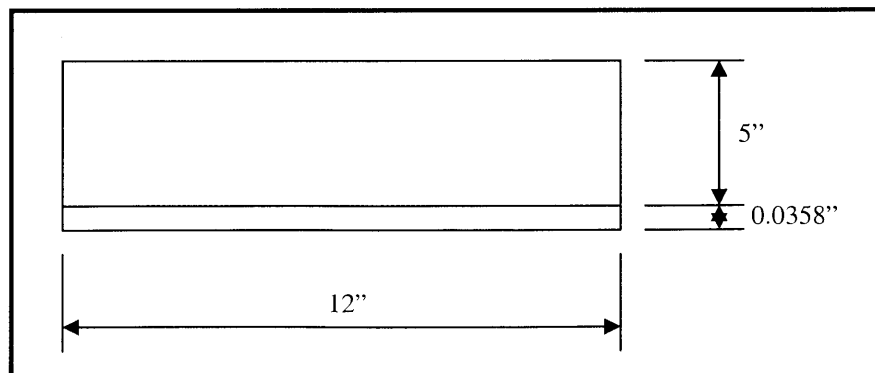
Unit cross section of composite floor in longitudinal direction
